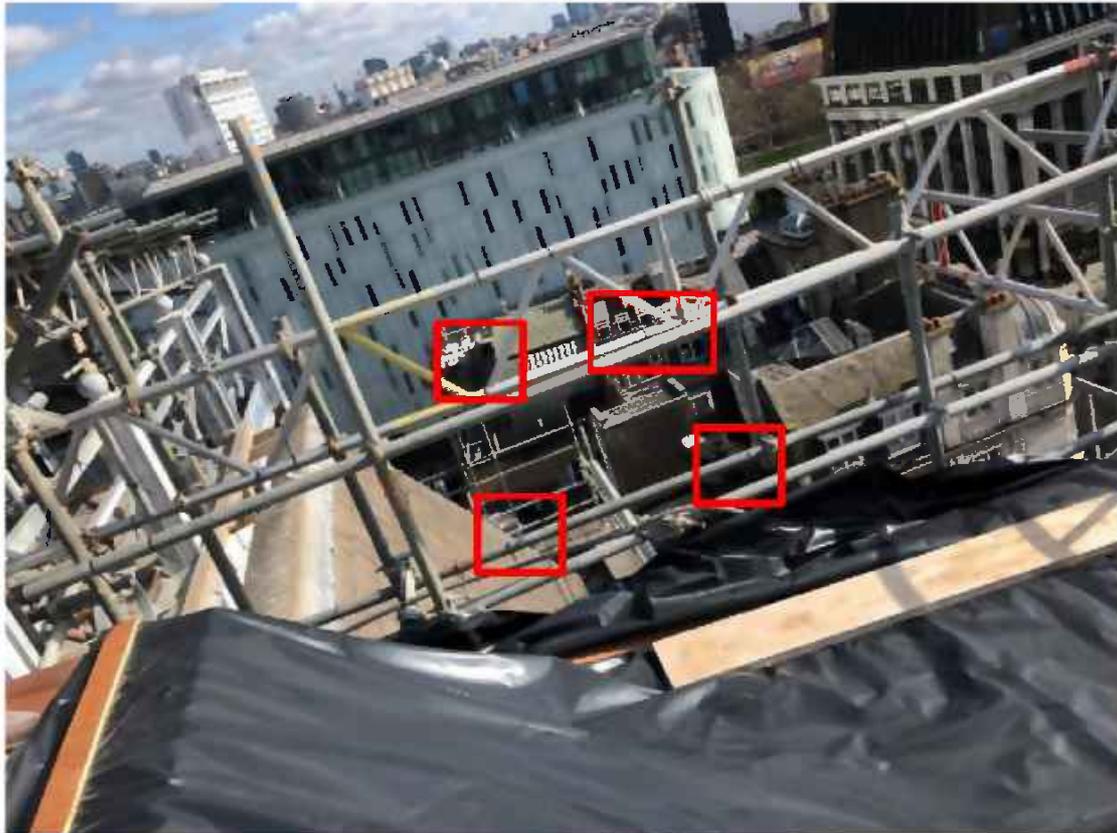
View from southeast corner of roof terrace, looking to the east. Plant noise sources on the opposing roofline marked
